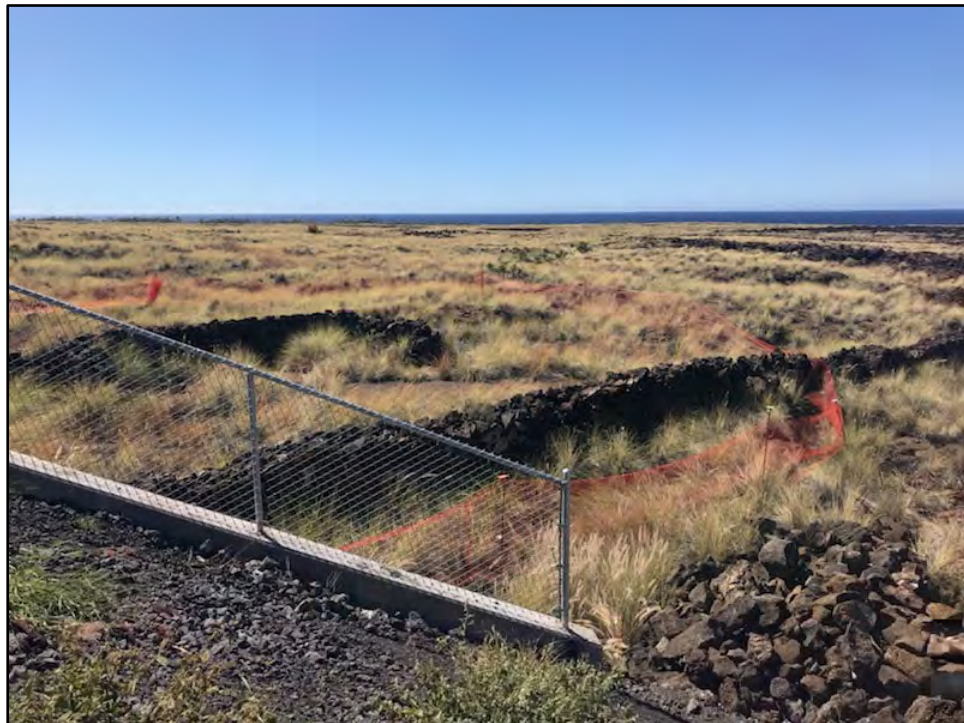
Photo of northern end of Retaining Wall F, note SIHP # -06432 in center and SIHP # -10154 in background; view to southwest
